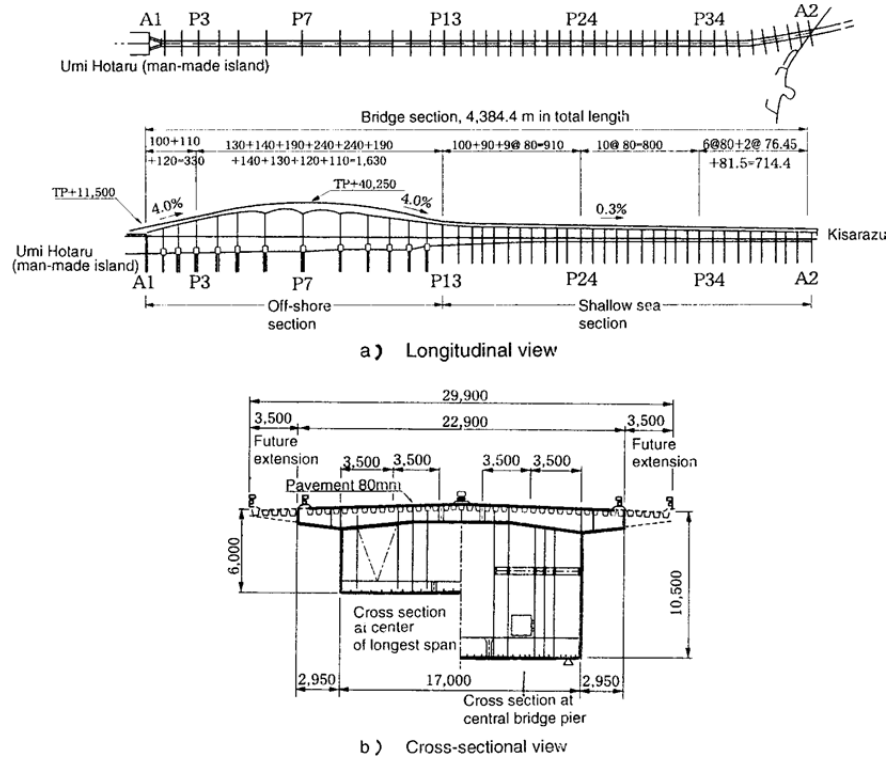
(a) (b): Outline of bridge structure for Trans-Tokyo Bay Crossing Bridge. [34]
